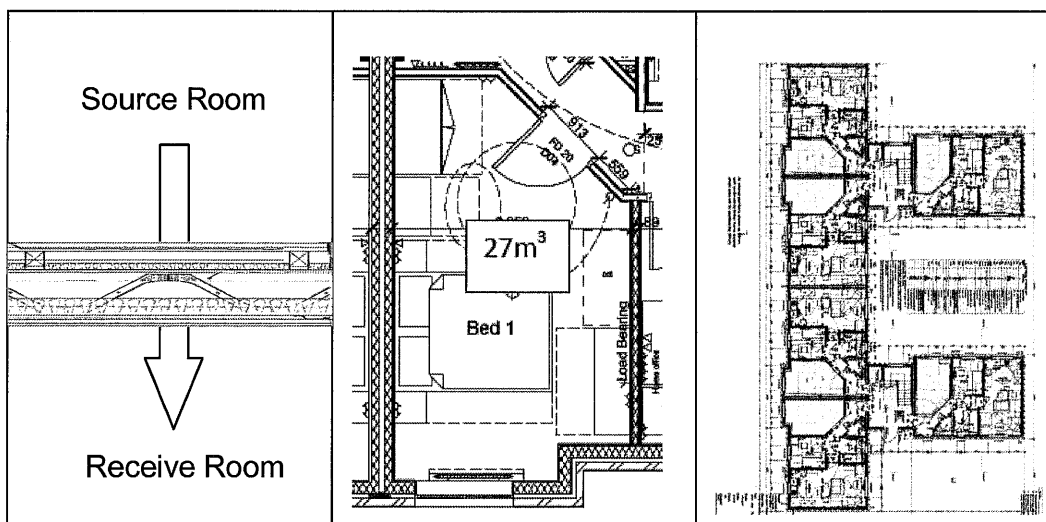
Matched room pairs, room shape & volume and location on site plan.
